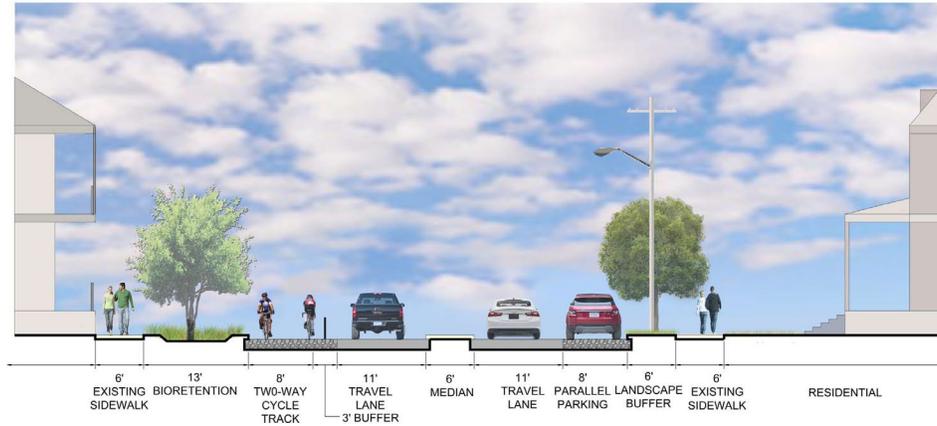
16th Street Underpass (7th Avenue to 5th Avenue)
